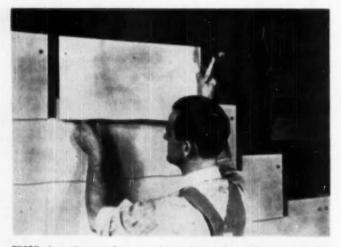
PHOTO above illustrates the approved method of applying asbestos-censes siding shingles. First, the sheathing or oid siding is covered with a felt underlayment. Shingles are then aligned and natiled in position, using non-correstve nails, with a leit backer strip at each joint. Strips inp lower courses. At least one nail penetrates each strip
